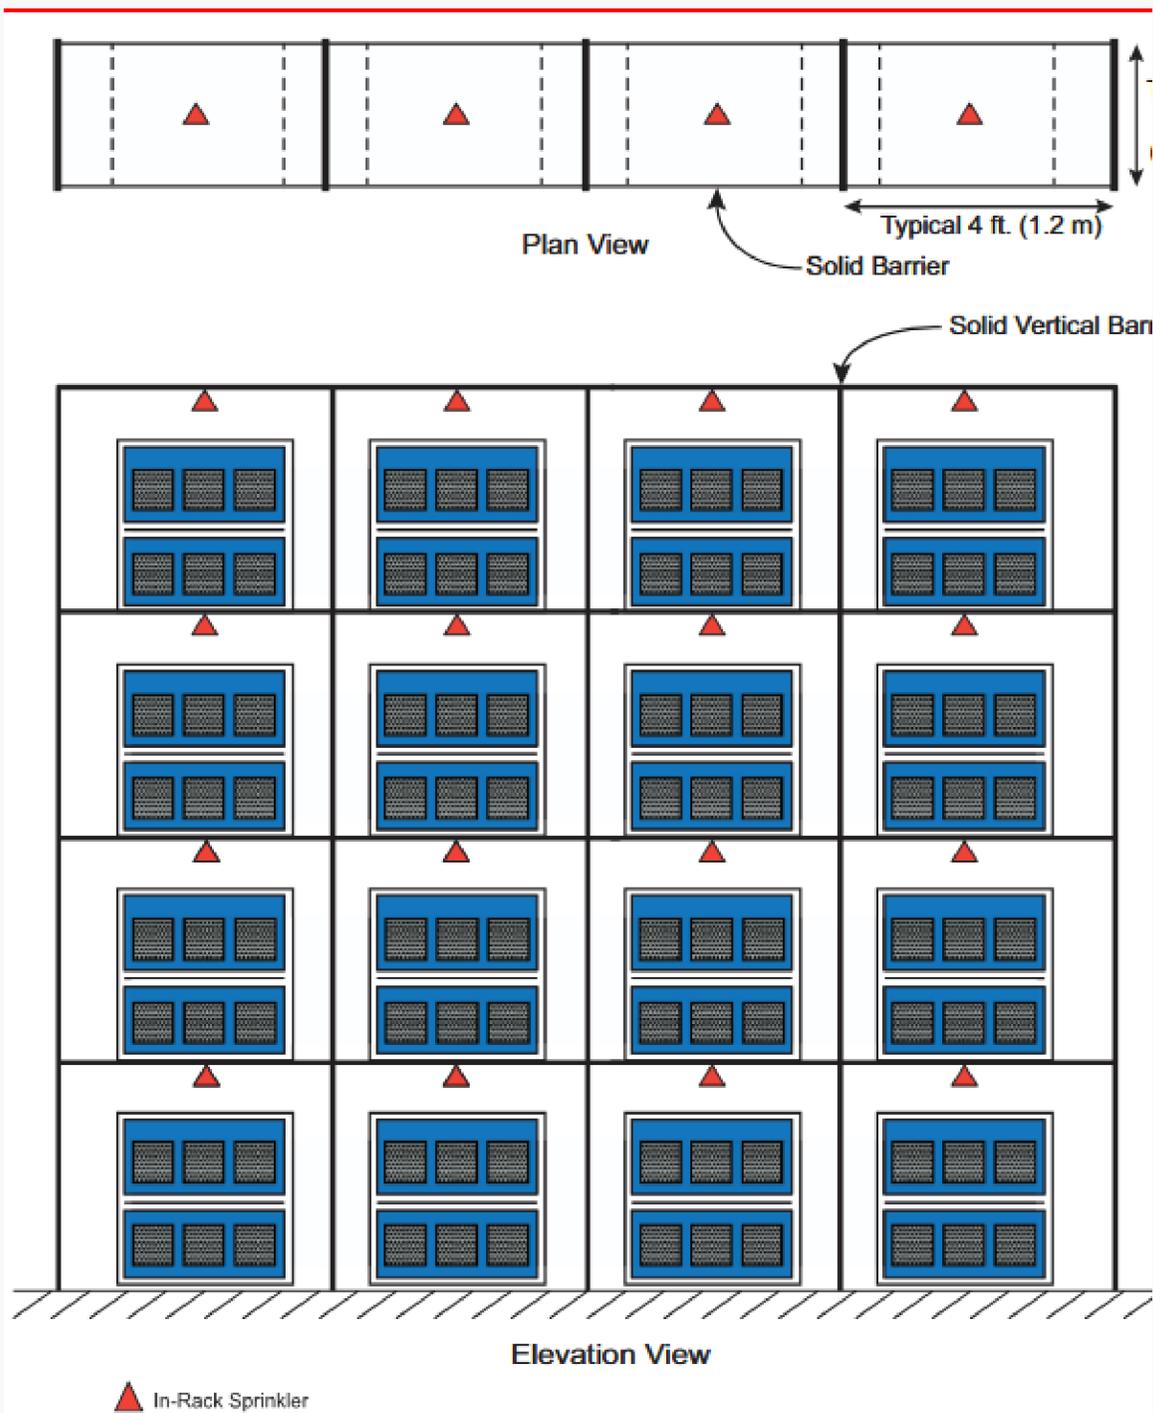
In-rack sprinkler layout for lithium-ion cell formation and aging bin-box storage arranger.
